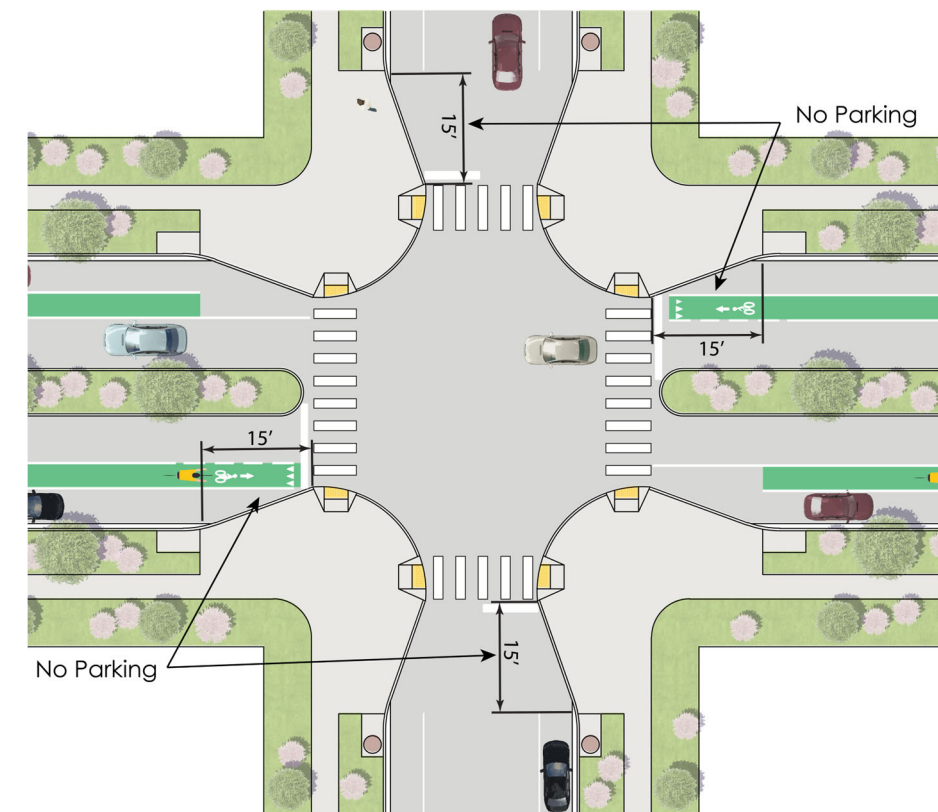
DAYLIGHTING AT A TYPICAL INTERSECTION WITH BULB-OUTS
